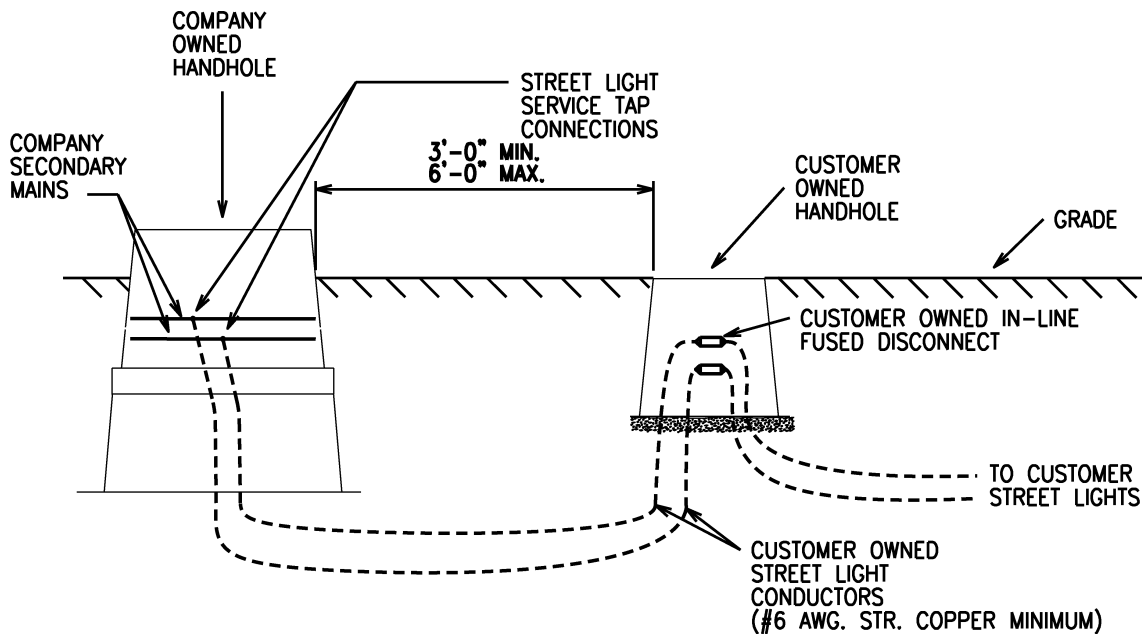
Connection of Underground Supplied Customer Owned Outdoor Lighting to PPL Handhole or Manhole – Standard Connection
